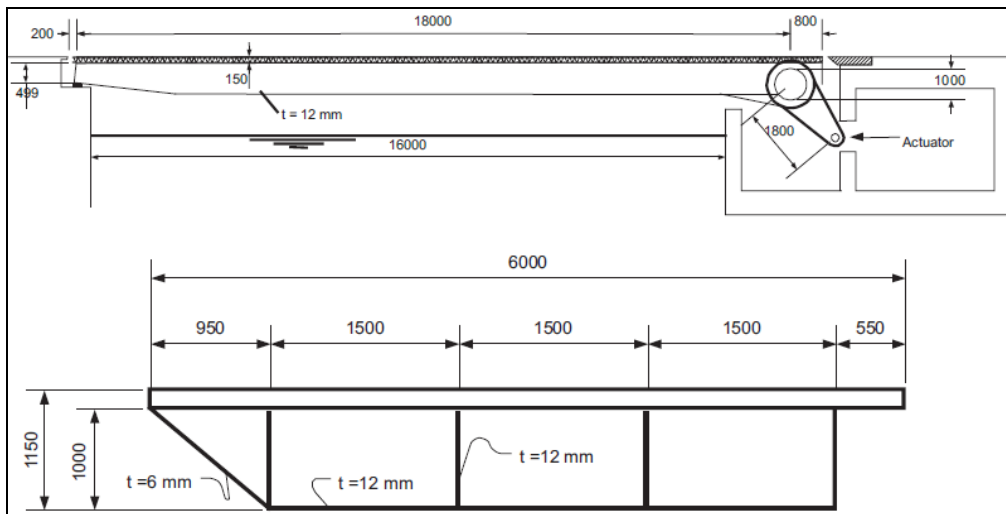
1. Longitudinal (top) and transverse (bottom) cross-section of the bridge [2]
